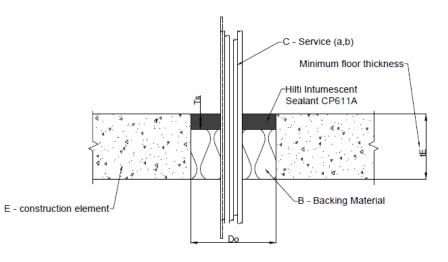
Side View, seal type 16, AS 1530.4:2014 Standard D1 Cable set in concrete floor
